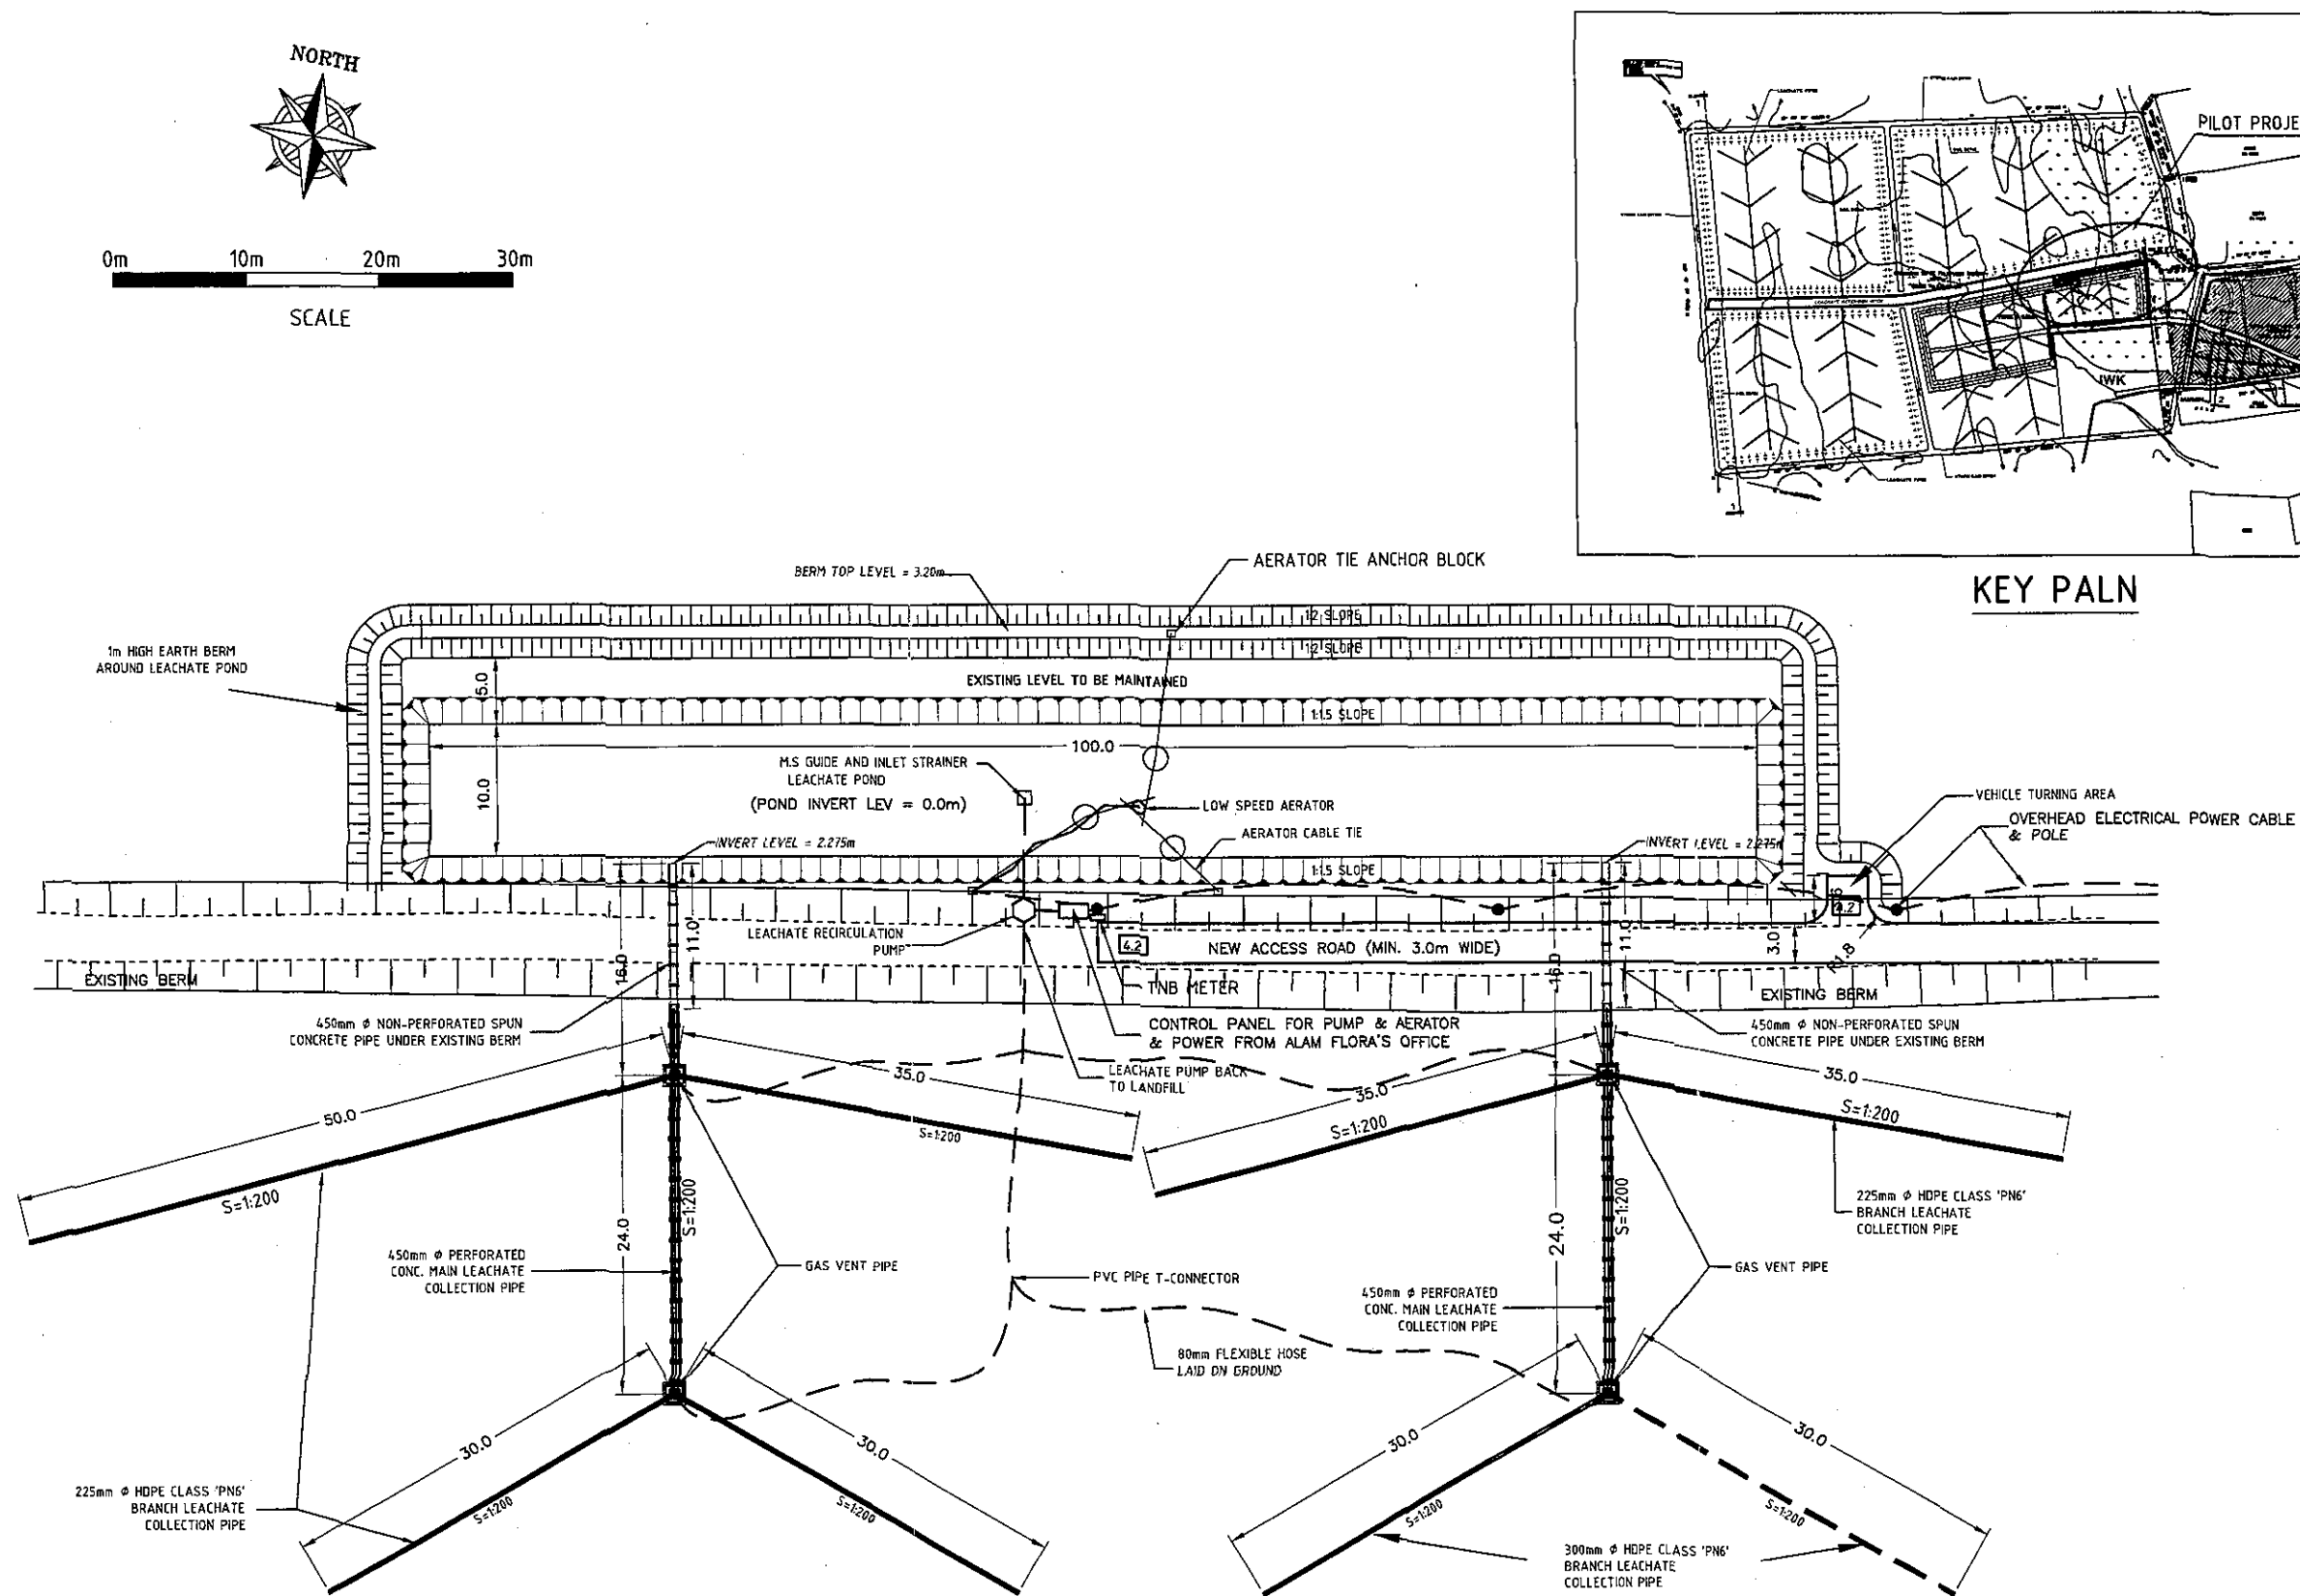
Layout Plan (Pekan Nenasi Pilot Project)
